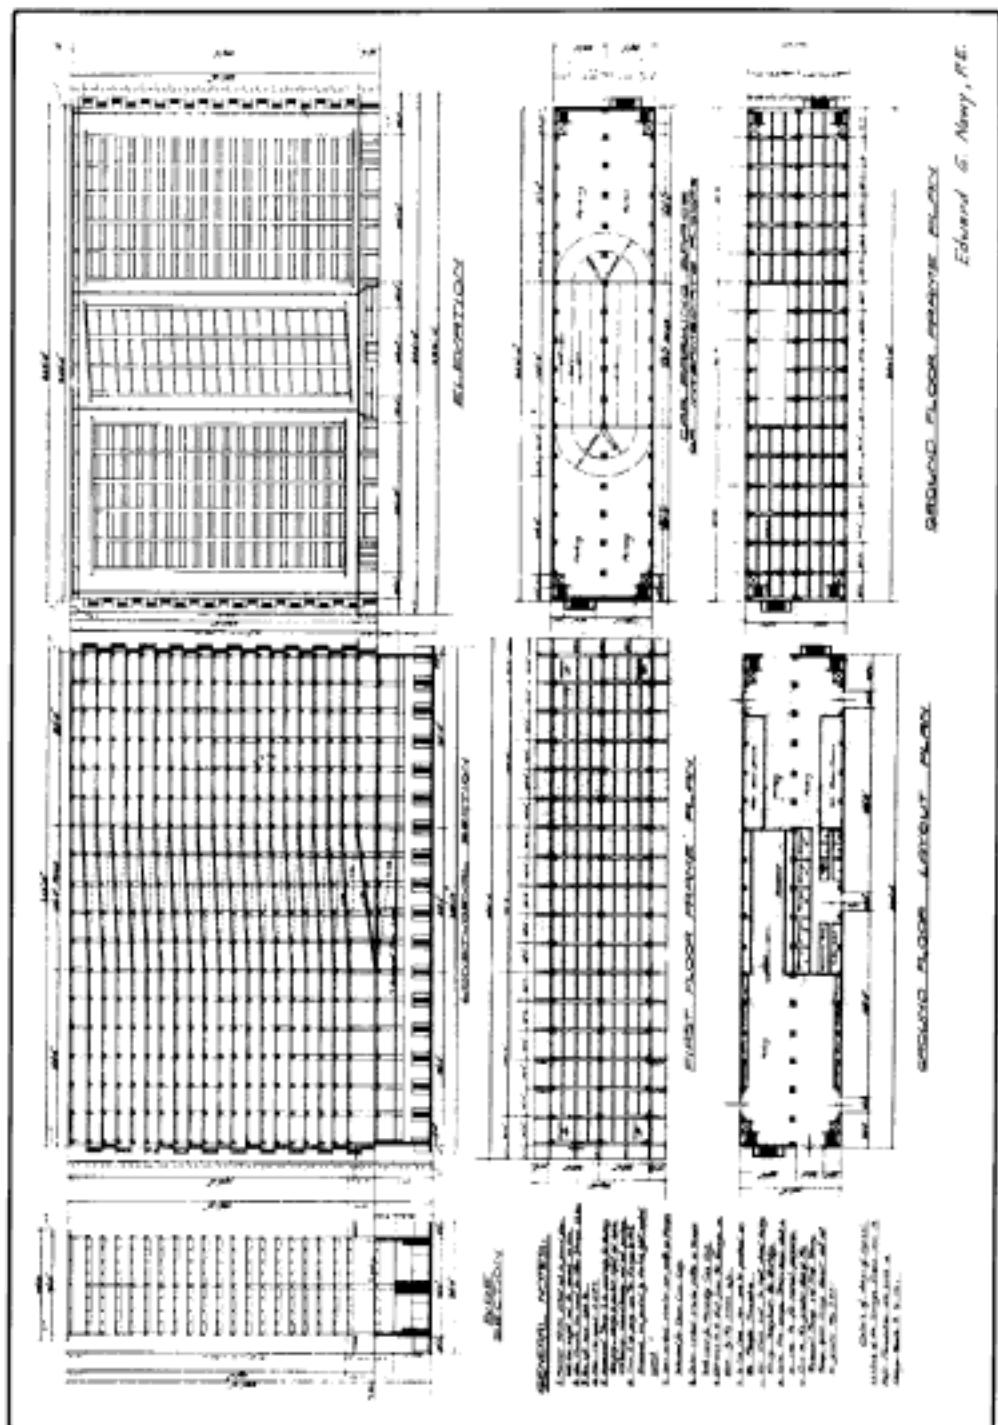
Typical working drawing for a reinforced concrete parking structure. (Design by E. G. Nawy.)
